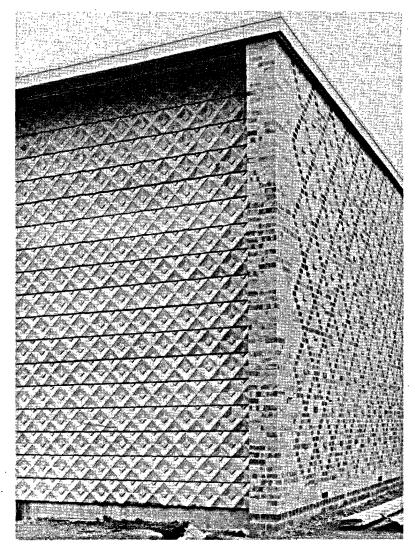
Moulded concrete facing slabs on a school building at Ipswich, Suffolk.
